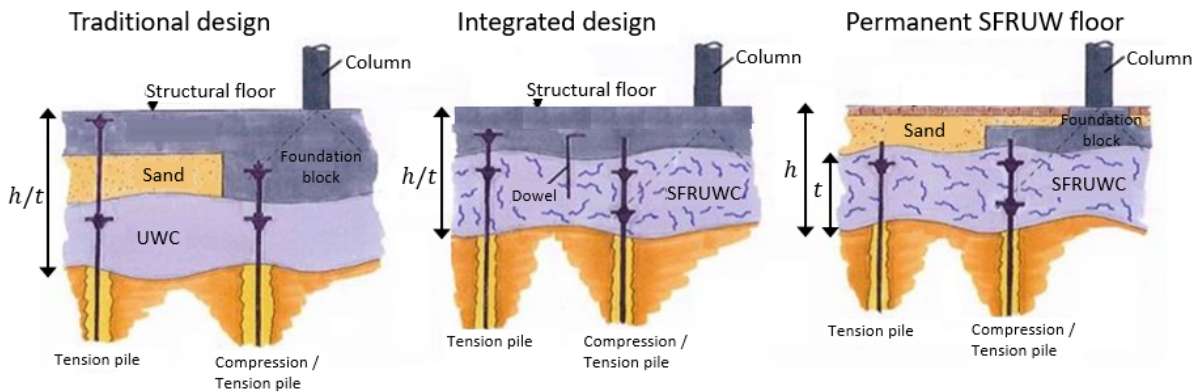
Design types of UWC floor construction. h indicates the excavation depth and t indicates the construction thickness. Modified from ABT (2016)
